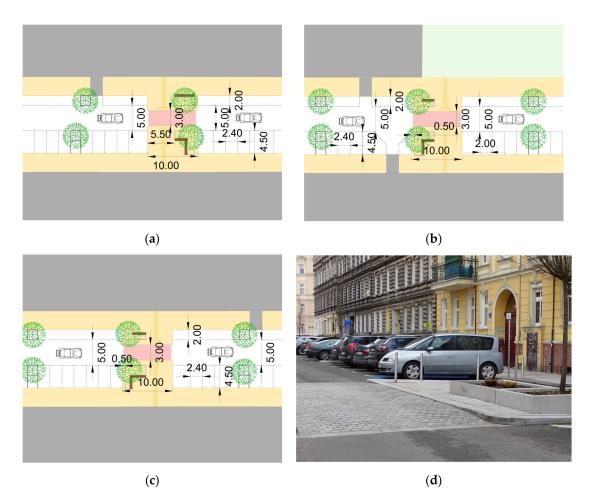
Treatments of chokers/raised pedestrian crossings: (a) testing ground No. 1; (b) testing ground No. 2; (c) testing ground No. 3; (d) design details of the sinusoidal approach ramp to the raised crossing and a view of a concrete planter. Source: own work of the author based on the design documentation [40].
